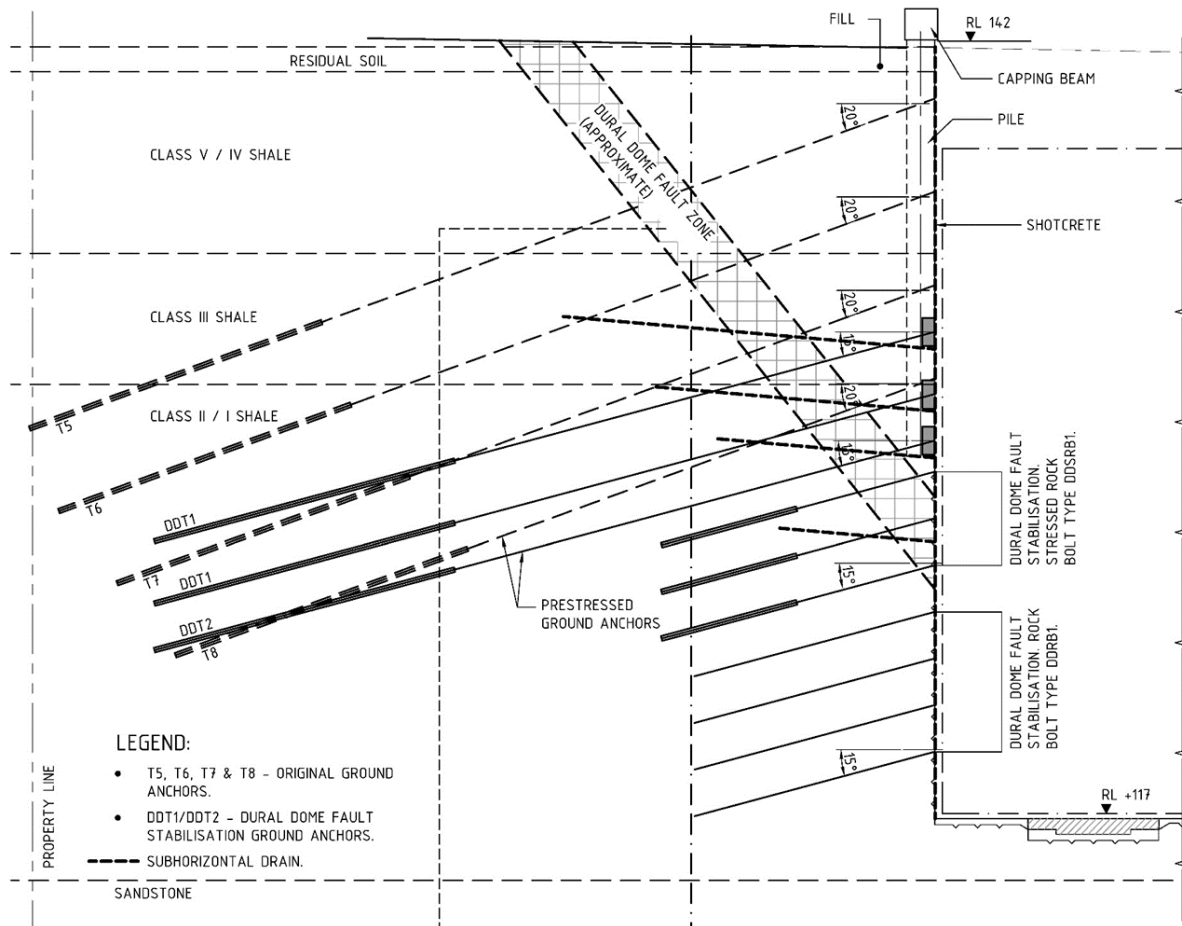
Typical cross-section showing the additional ground anchors and sub-horizontal drains
